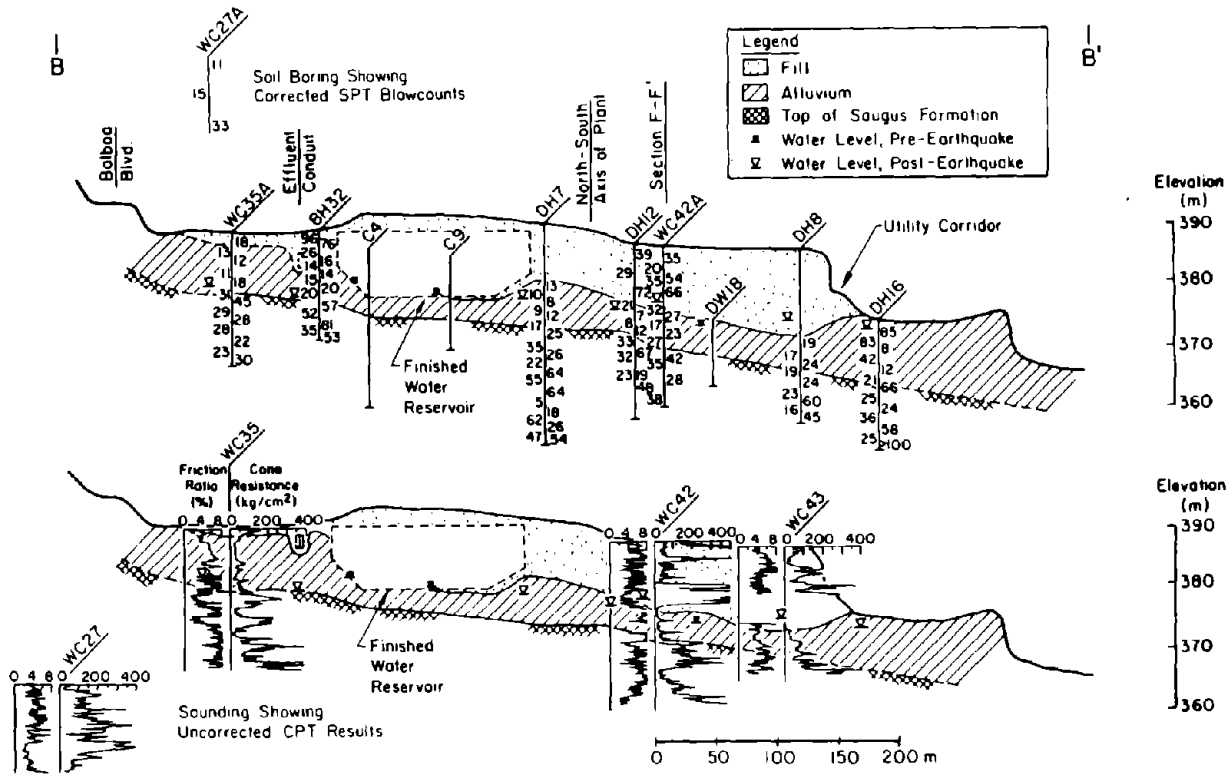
Soil Profile at Cross-Section B-B', Joseph Jensen Filtration Plant
